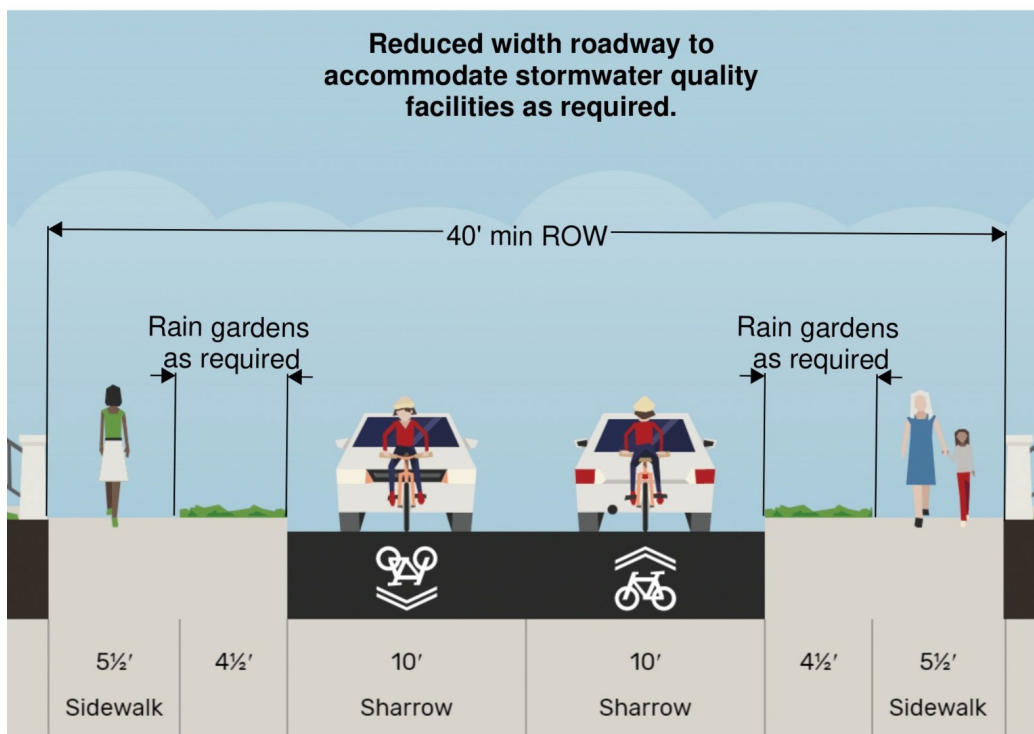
Family Friendly (Local Rural Street) at Stormwater Facilities
